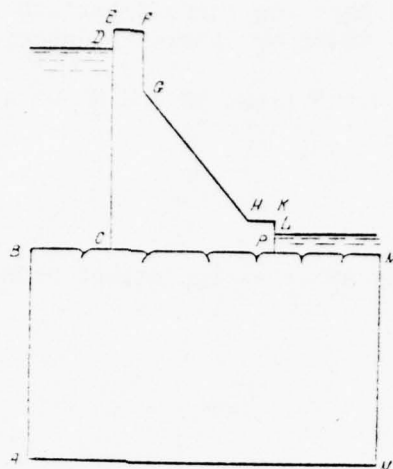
Vertical Transverse Blind Section of Concrete Gravity Dam
